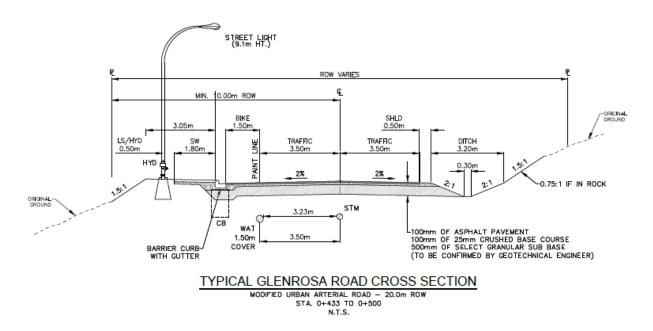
Updated modified Glenrosa Road cross section with boulevard width reduced to 1.25 m.
